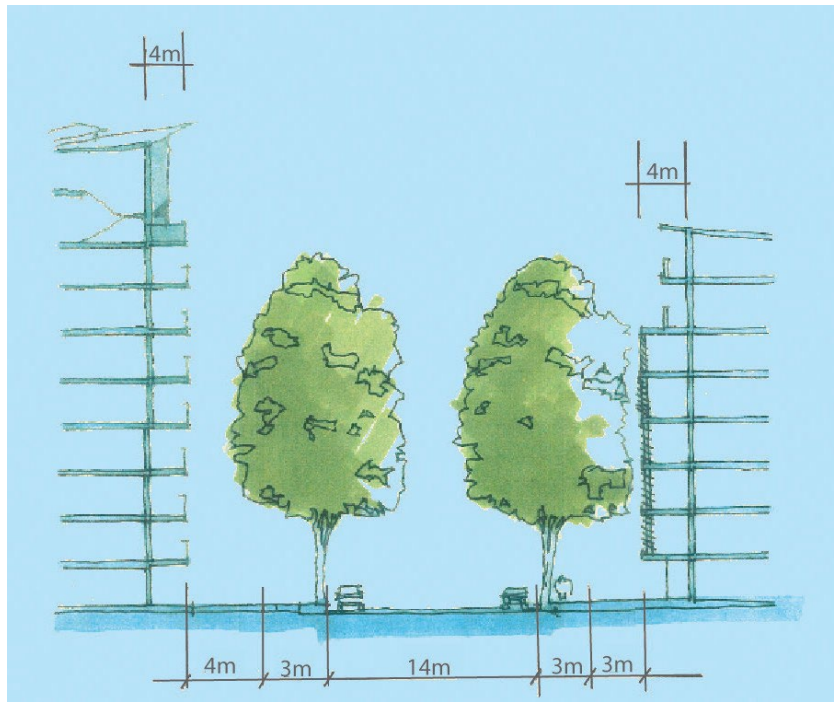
Type E tower element building as viewed from Morton Street looking north
